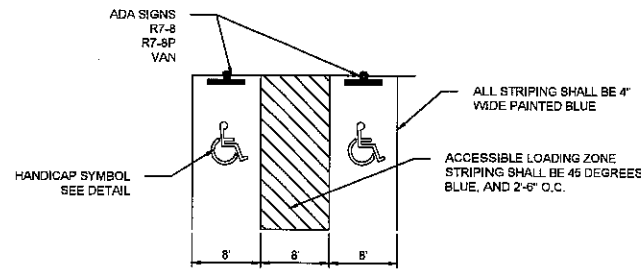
DETAIL AT HANDICAPPED ACCESS ADJACENT TO PARKING
